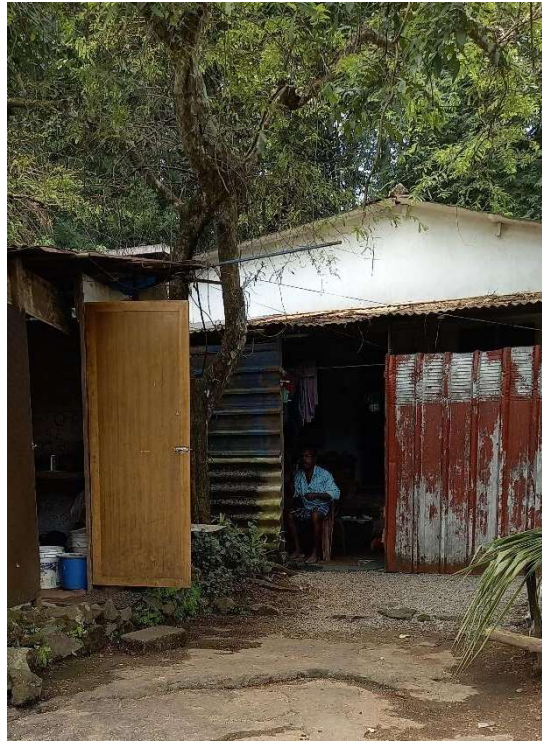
### DETAILS OF STRUCTURES NOT BELONGING TO THE OWNER:
